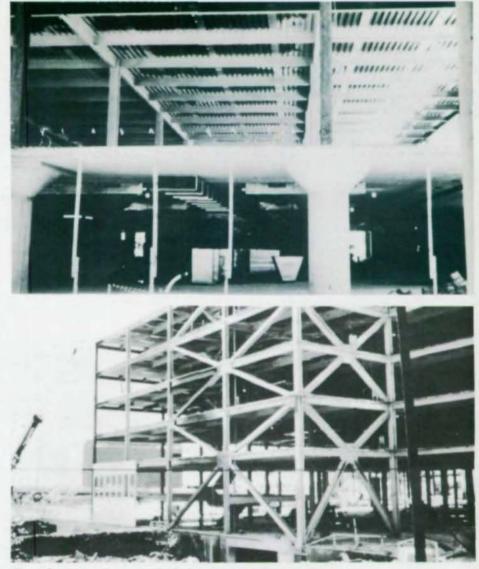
Steel-framed structure (top) above exhibition levels supports leased space. Fig. 5. (bott.). Lateral system of steel bracing shown.
